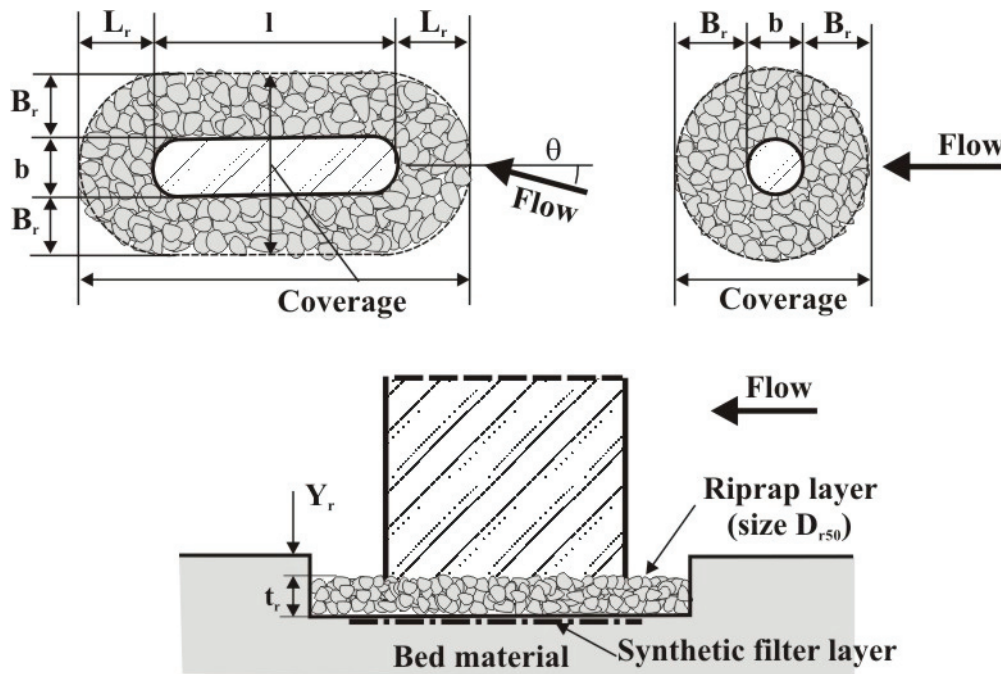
Definition diagram for placement of riprap protection at bridge piers.
